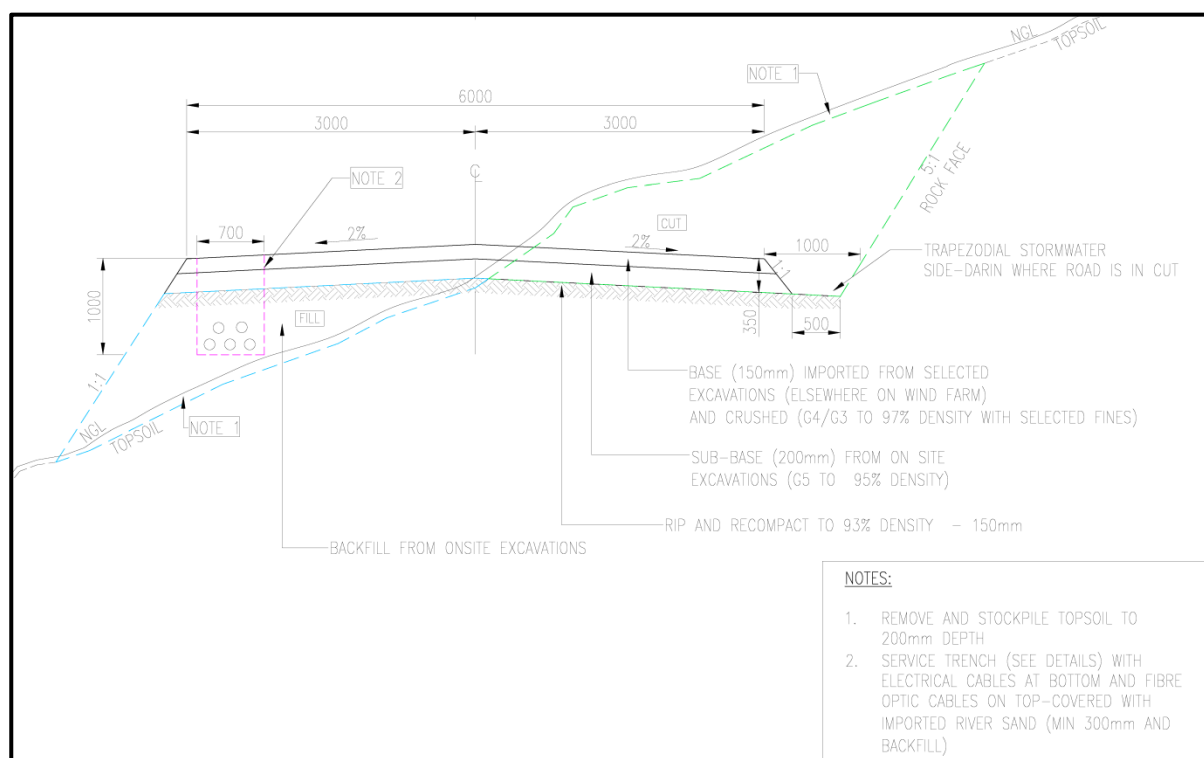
Typical road cross section for internal roads (see larger drawing in Appendix F) (Source: Africoast)
